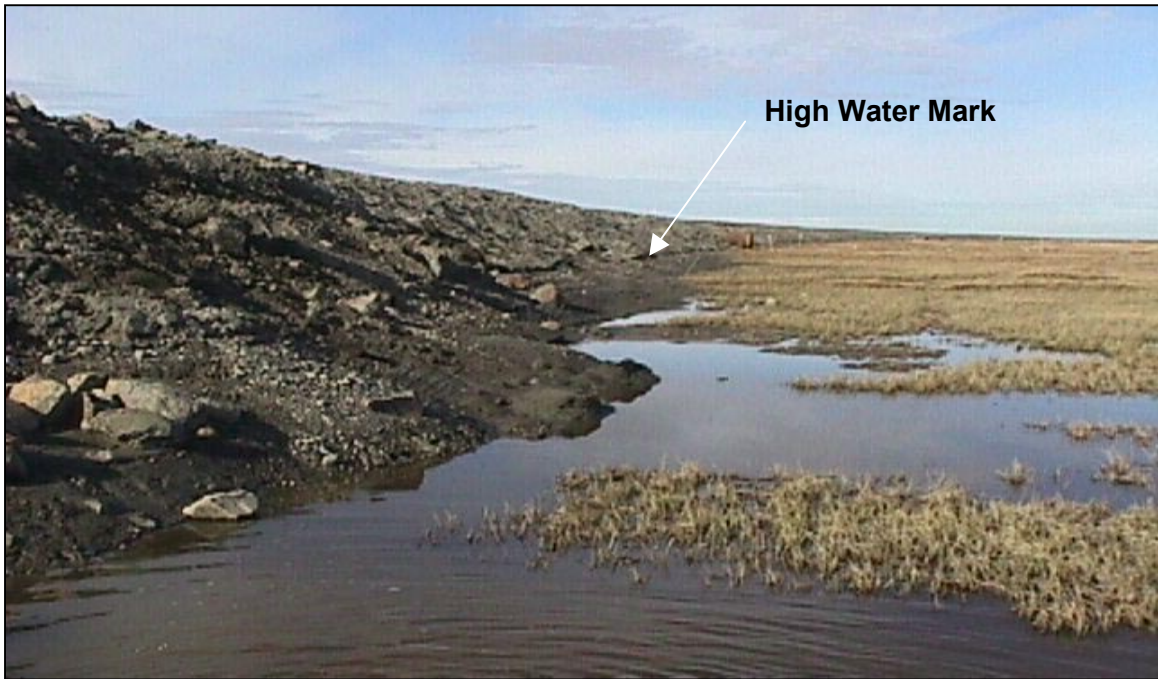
Looking west along the north side of the embankment on the road to CD-2 near culvert CN-5. (6/18/00)
